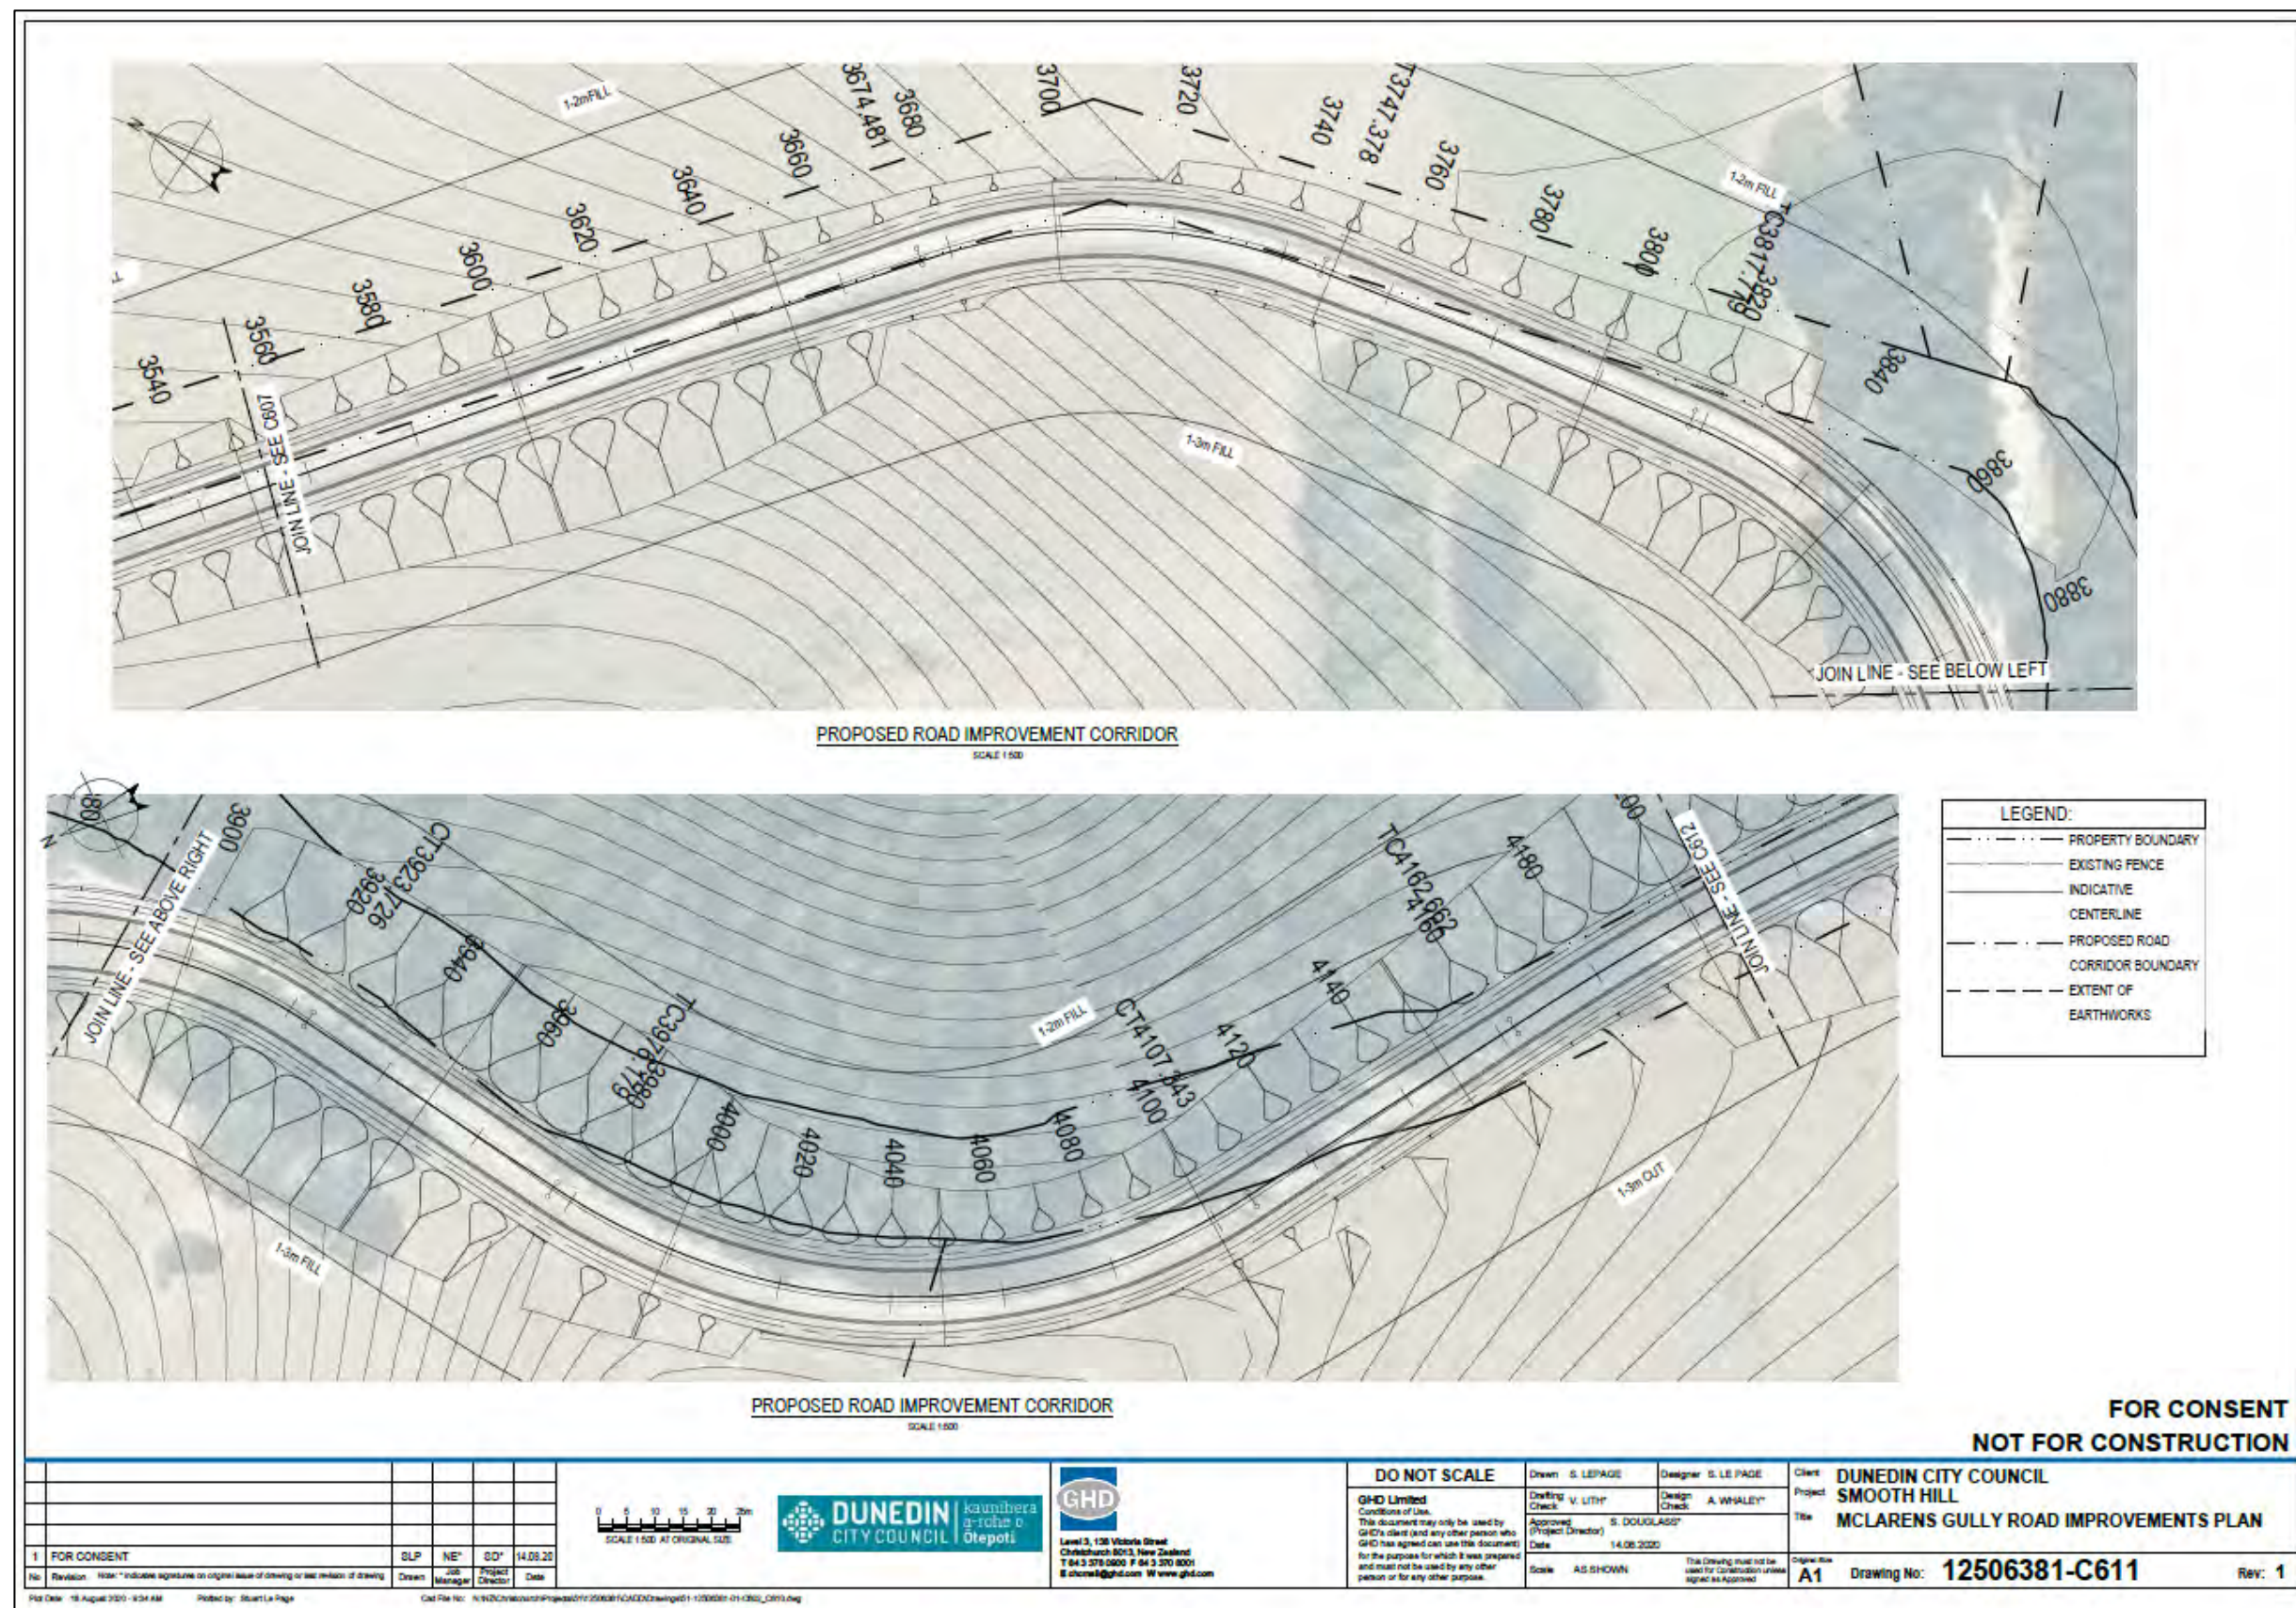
Section of McLaren Gully Road showing proposed widening showing example of works. Plans provided by Boffa Miskell.
